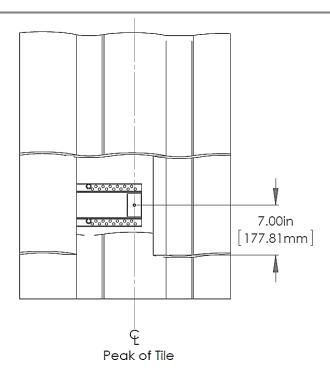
S Tile Installation (Rafter West Orientation Shown) Layout Dimensions Same in East or West Rafter Orientation
